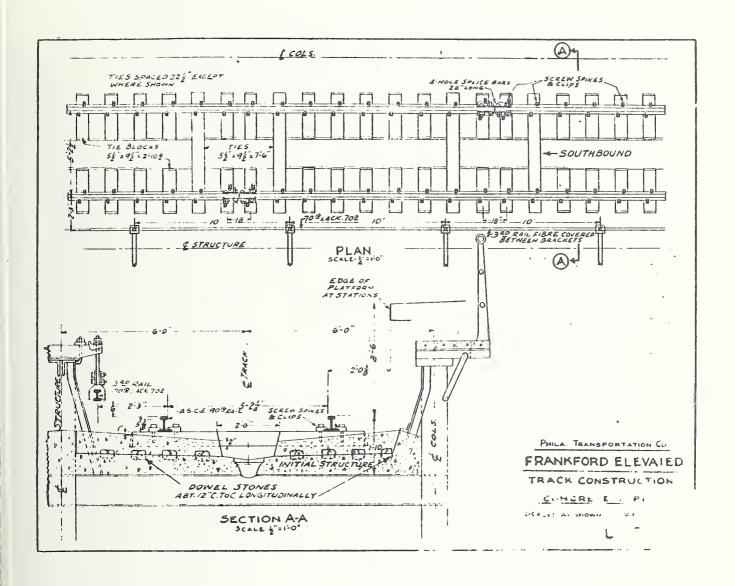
SEPTA FRANKFORD LINE CONCRETE VIADUCT TRACK CONSTRUCTION
